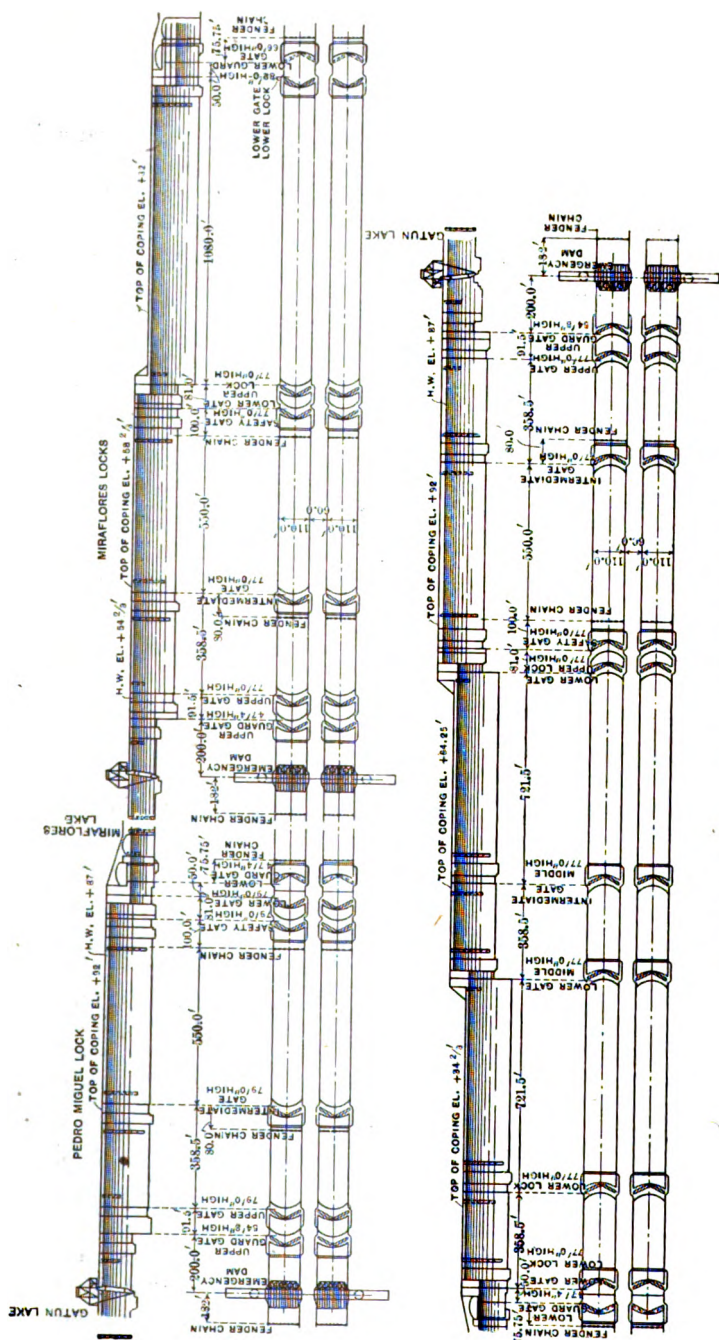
GENERAL PLAN AND PROFILE OF ALL LOCKS.
